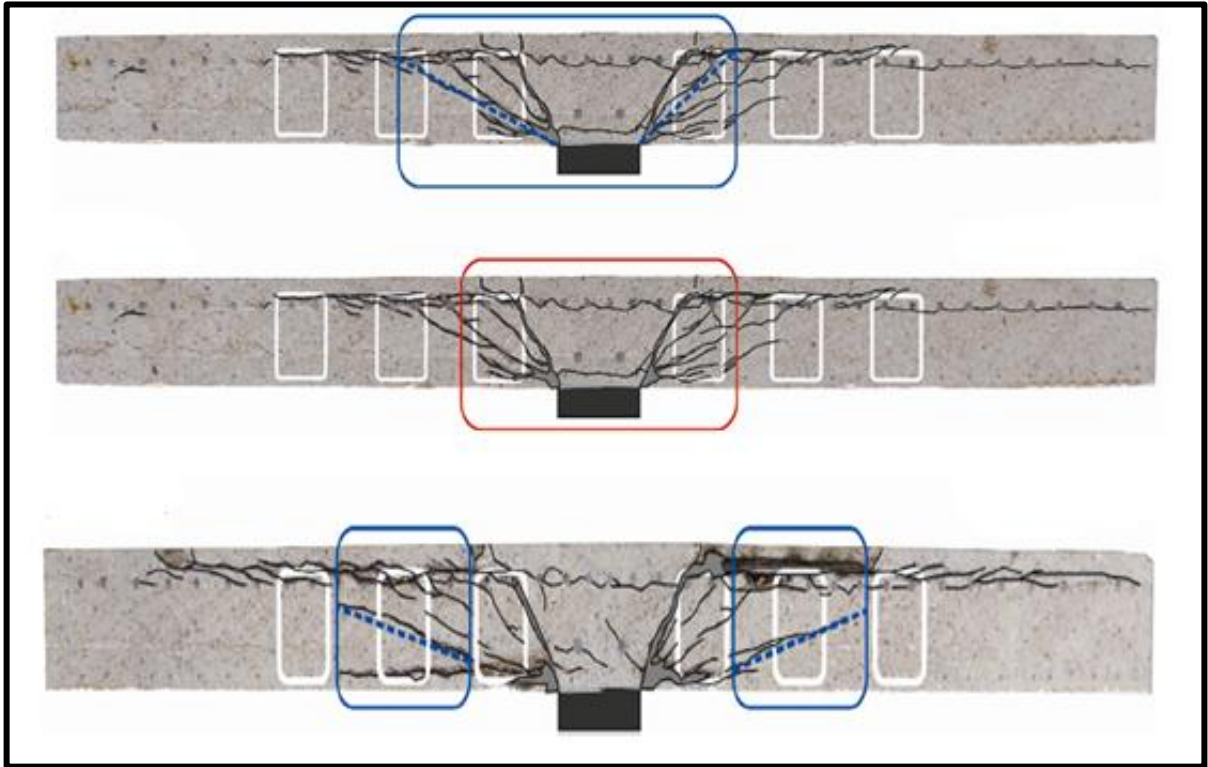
Failure crack of test slab (Schmidt et al., 2020).
